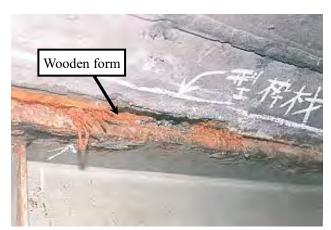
Wooden form which was left in the slab concrete
